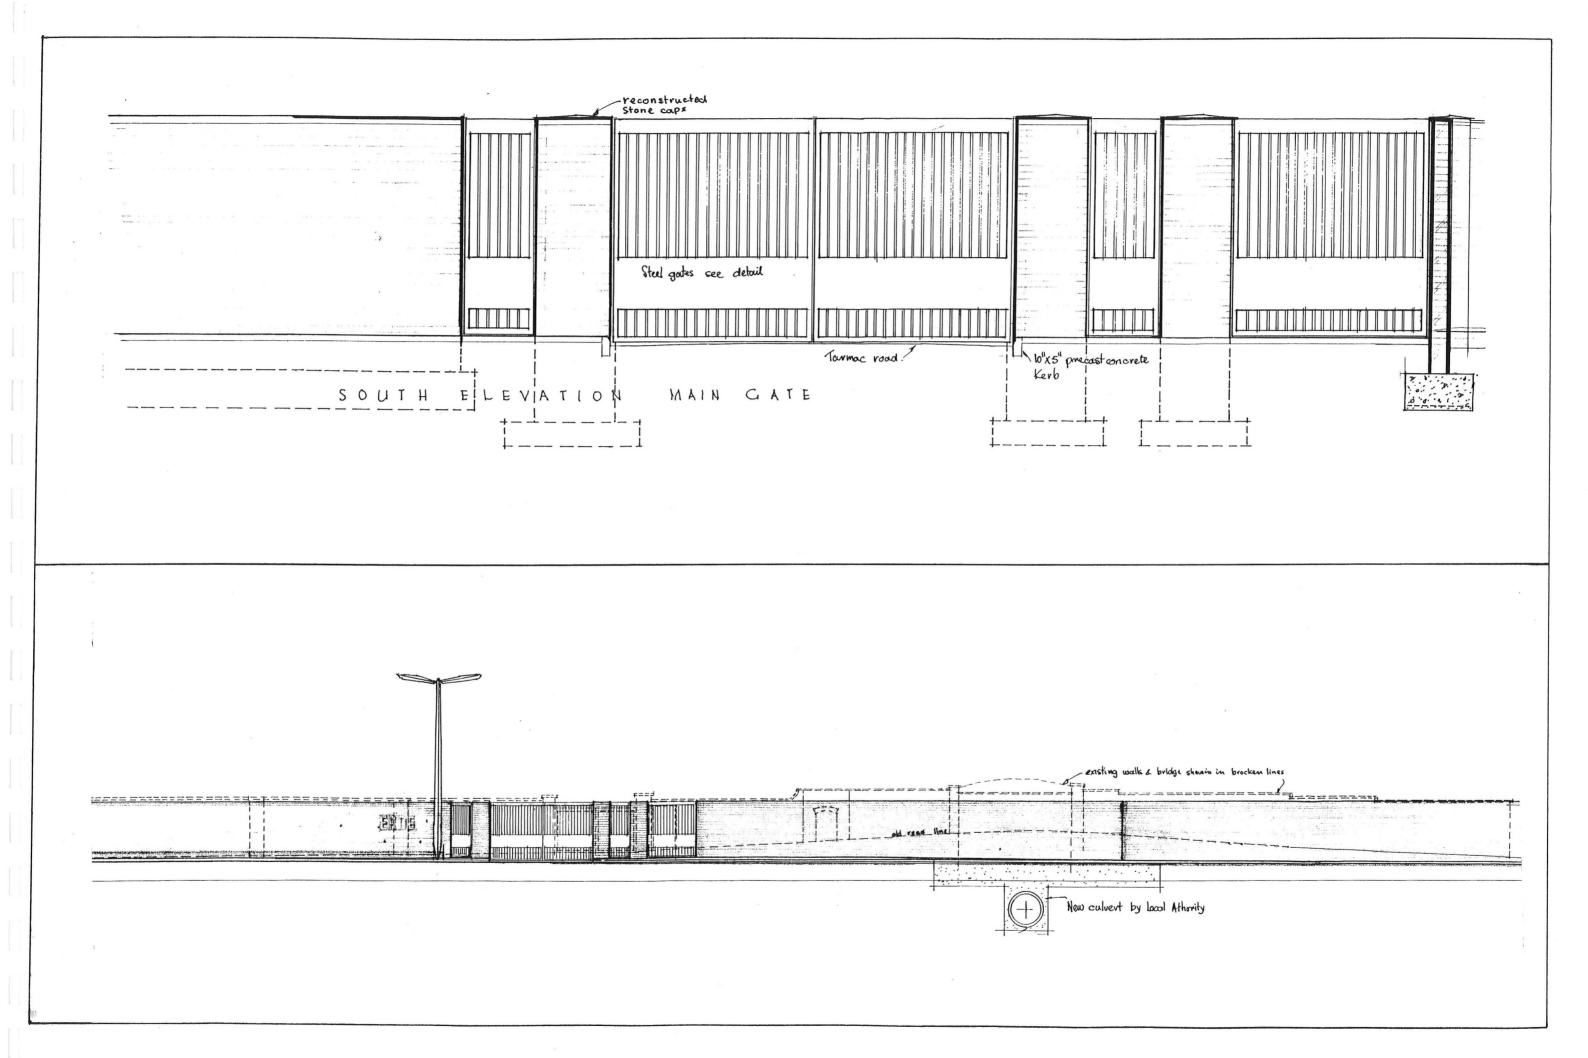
Top – detailed elevation of the gates (from H37 B.02) and bottom – elevation of the wall (from H37 B.01).
